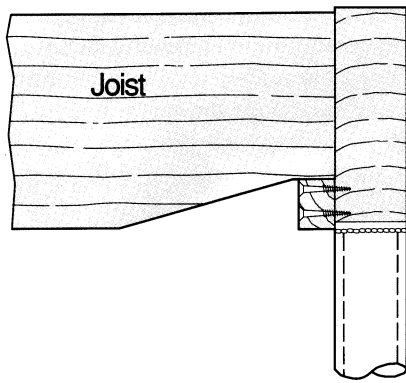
Design to minimise tilting of joists due to shrinkage of a supporting beam. (Note quarter-sawn beam and sloping cut to joist to avoid weakening effect of a notch)
